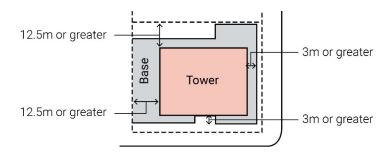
b. Setbacks for point tower high-rise buildings located on a corner site.
